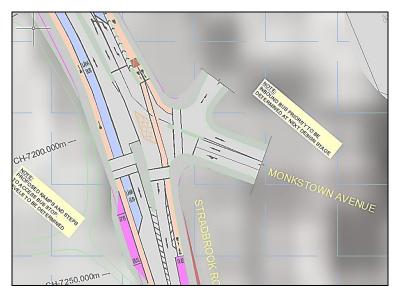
F: Scheme M1 Option 2 design at Monkstown Avenue / Stradbrook Road junction
